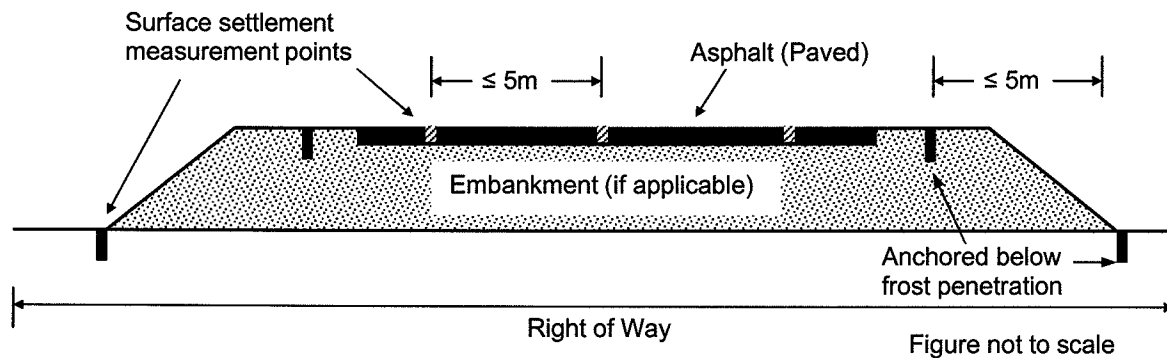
Typical configuration of surface settlement monitoring points along the tunnel alignment.
